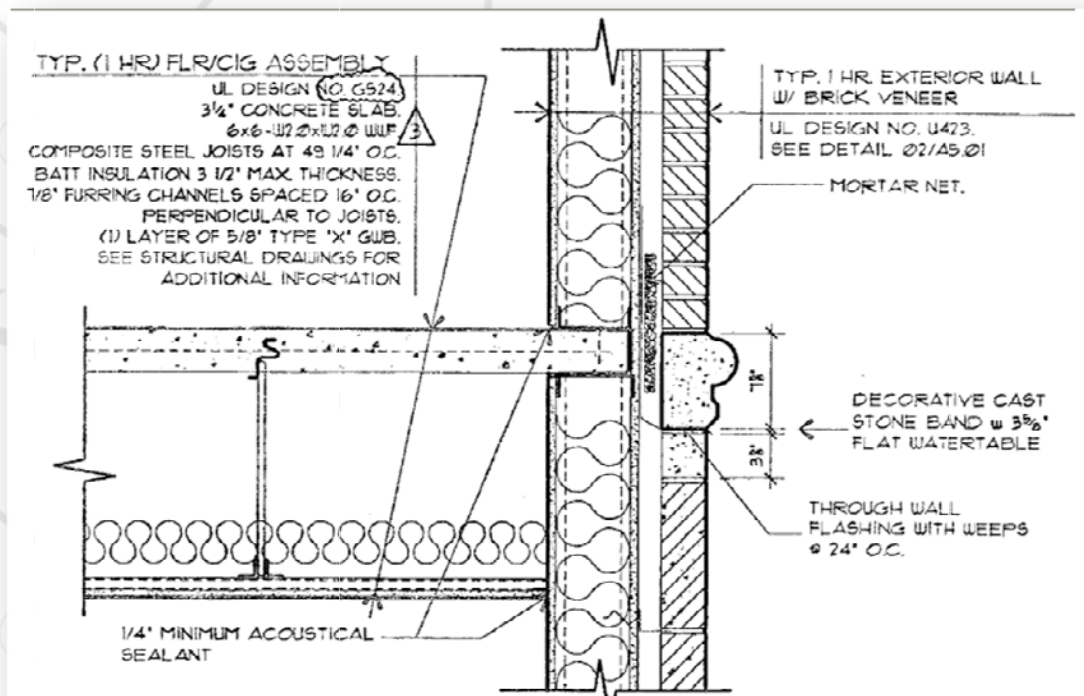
Wellington Condominiums Project Floor-Ceiling Assembly Detail
